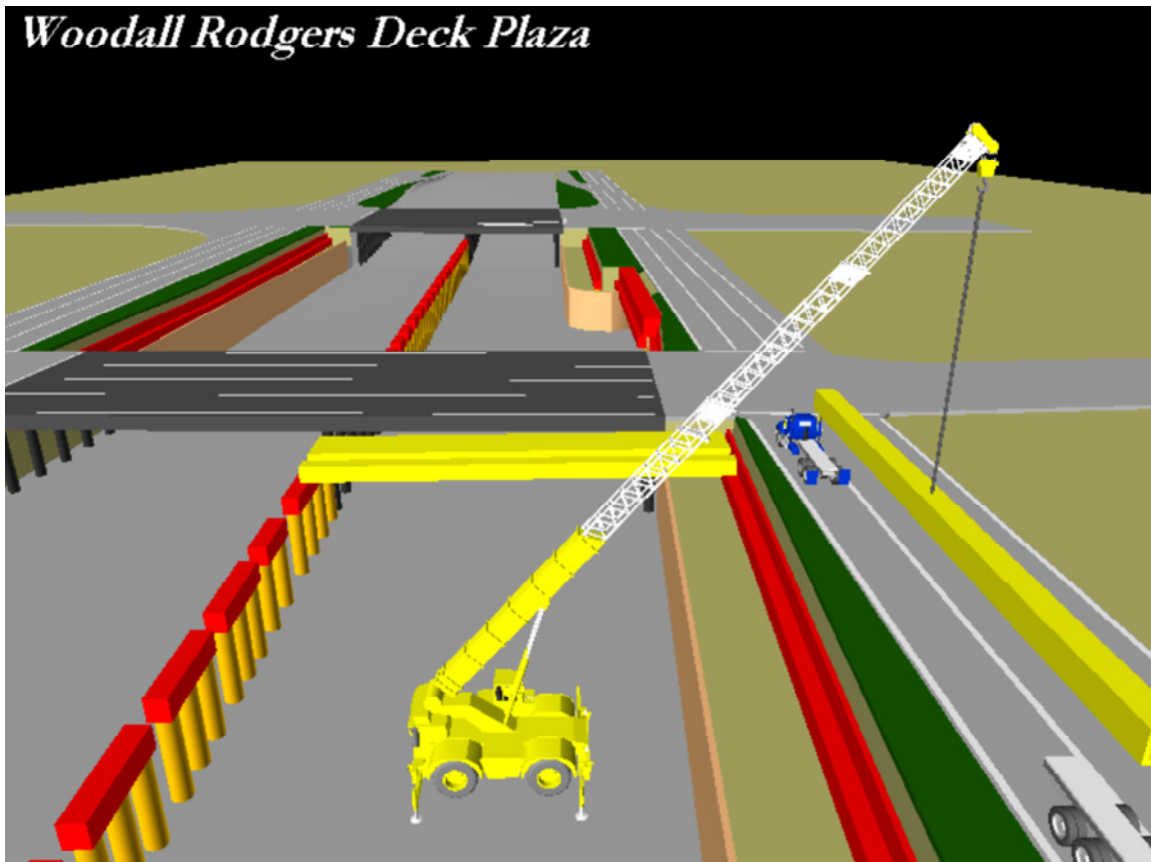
3D Model of a Crane Placing Beams Located On the Main Lanes.
